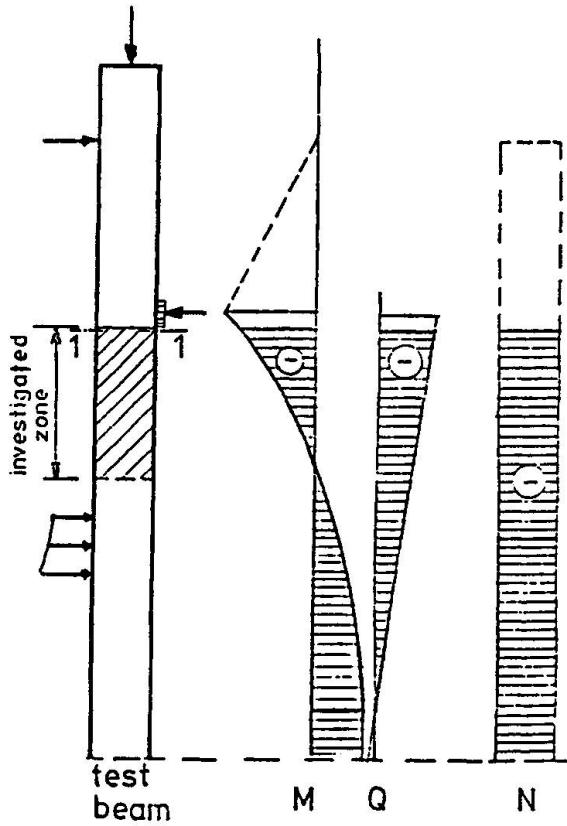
FORCES FOR THE BEAM-CANTILEVER SPECIMEN
